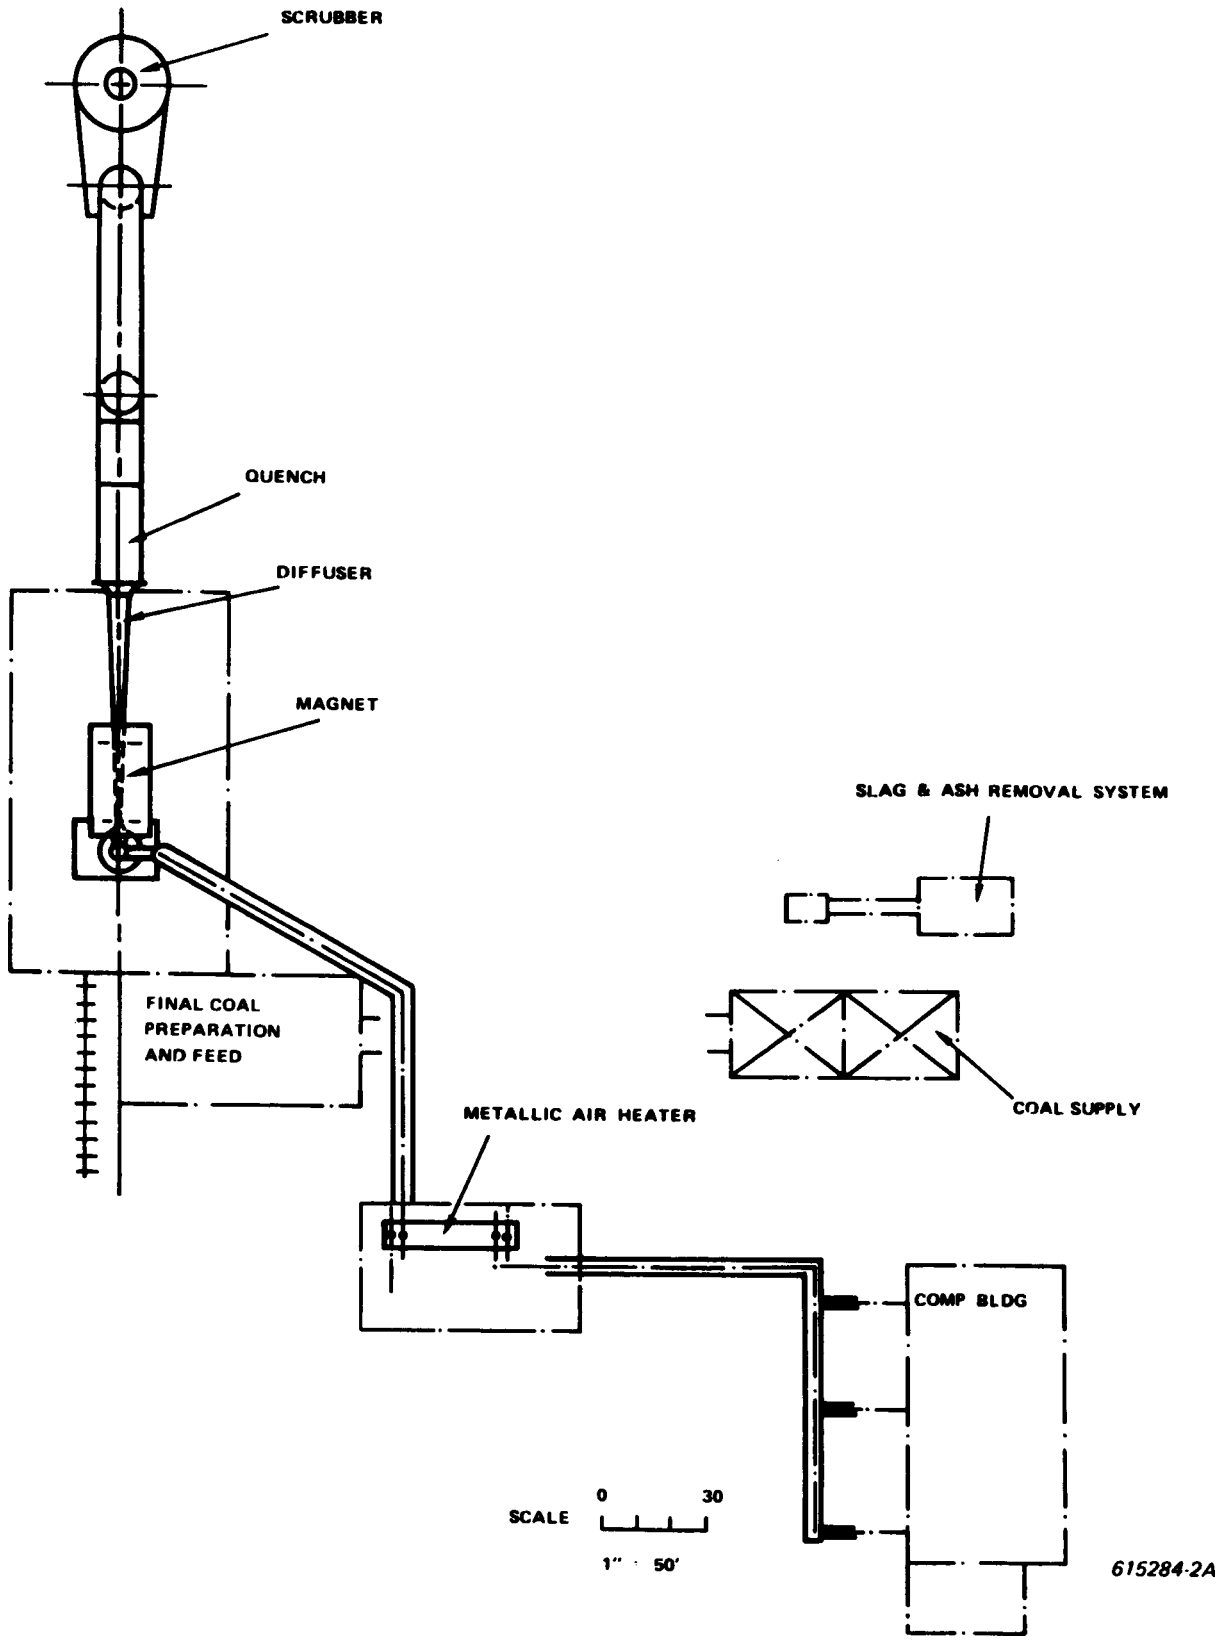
150 MW ETF Plant Layout - Configuration 1
